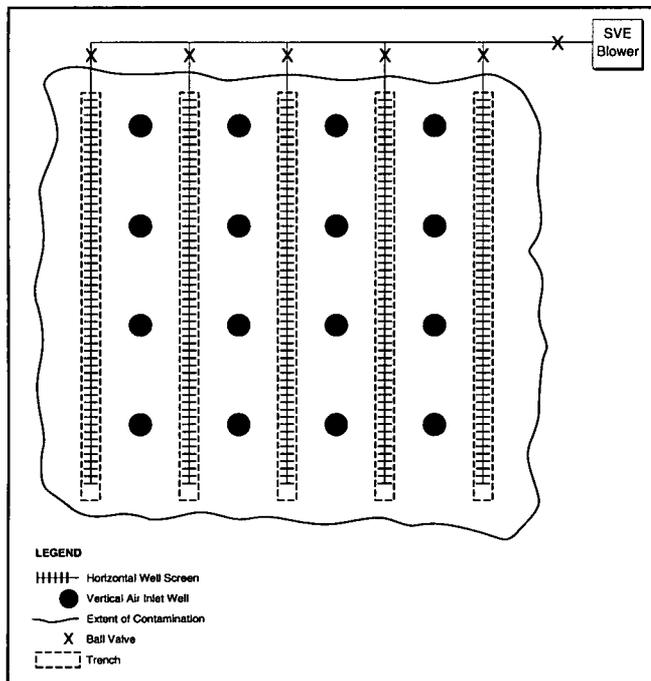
Plan view of typical horizontal extraction/vertical inlet well scheme.
